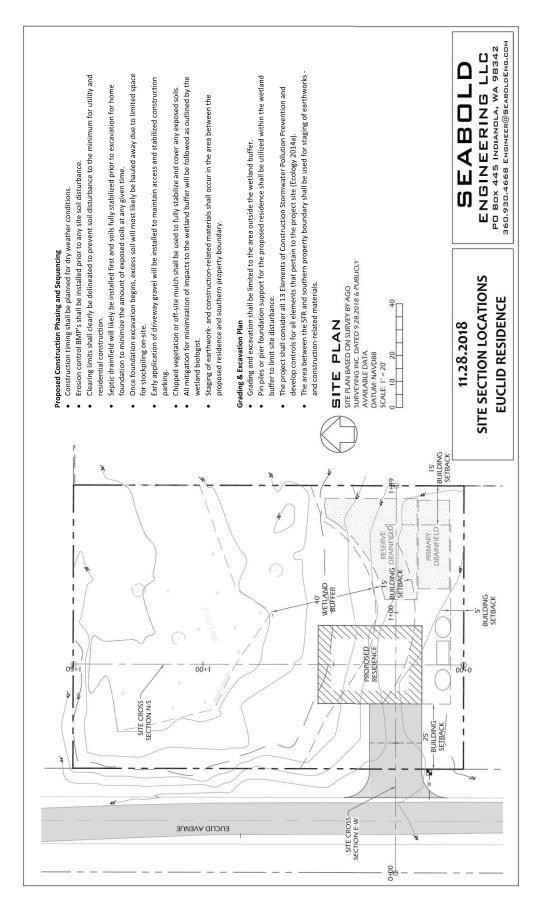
PROPOSED SITE DEVELOPMENT PLAN WITH CROSS SECTION LOCATIONS
